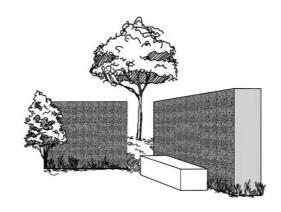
shows the elements that have been reused and placed around the urban area with new purposes. There are two types of concrete beams – the short one comes from the small buildings' common rooms and there are 20 in total. The long ones come from the main building and there are 5 in total. The facade elements are the ones that have been cut away in connection with the cut-out for the courtyard, these are made in aggregate.
